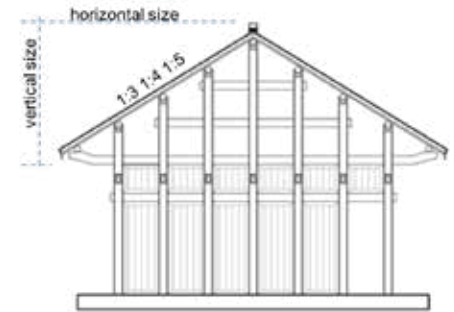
Internal structure and slope of roof (source: photo and drawing by author)
